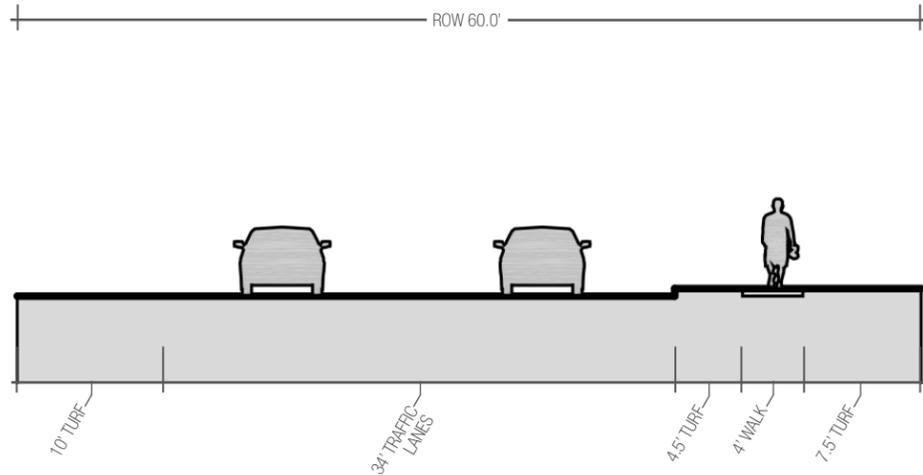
EXISTING 62ND TERRACE SECTION AND CONDITIONS
